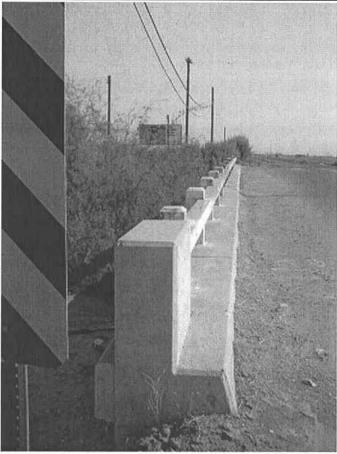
Scaroni Road bridge showing concrete and wooden guard rail, west side of the roadway facing north.
